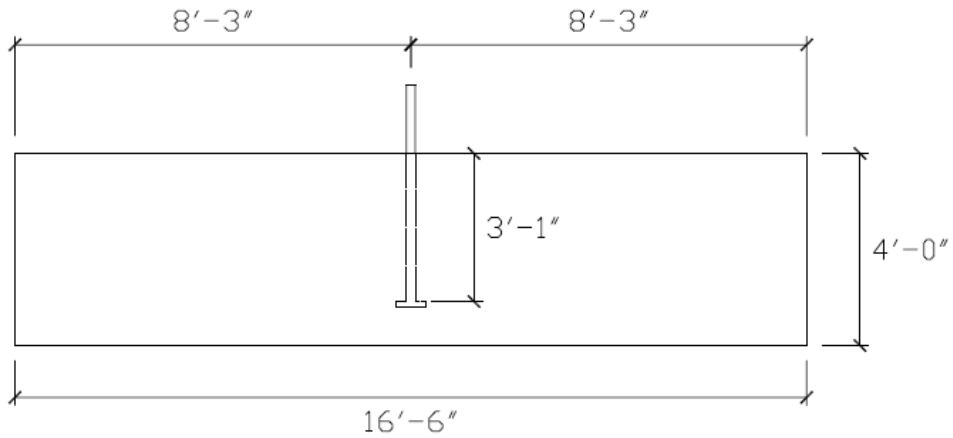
Elevation view of specimens with one No. 18 headed bar
